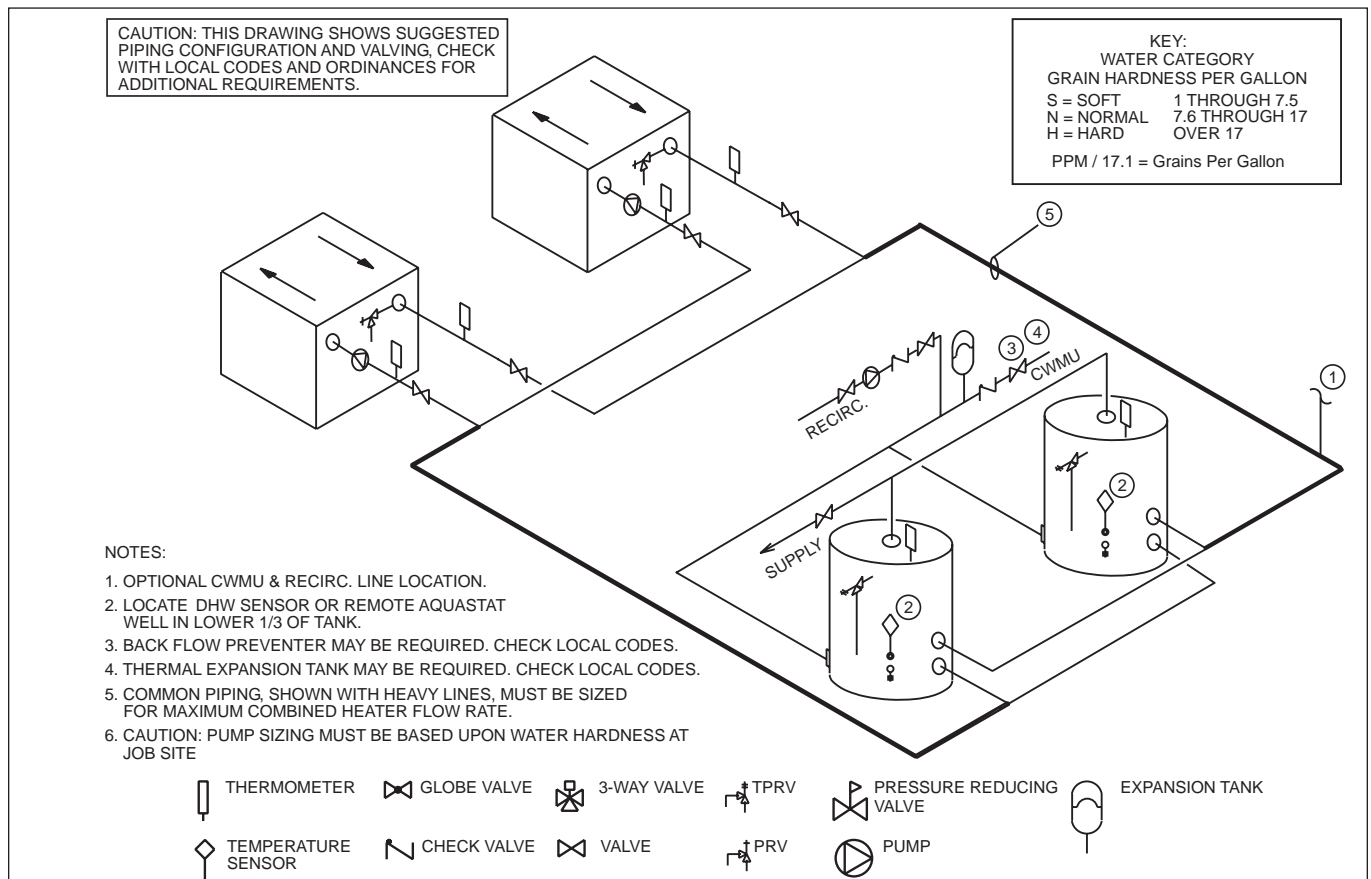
Water Heater Piping — Multiple Heaters, Multiple Tanks.
